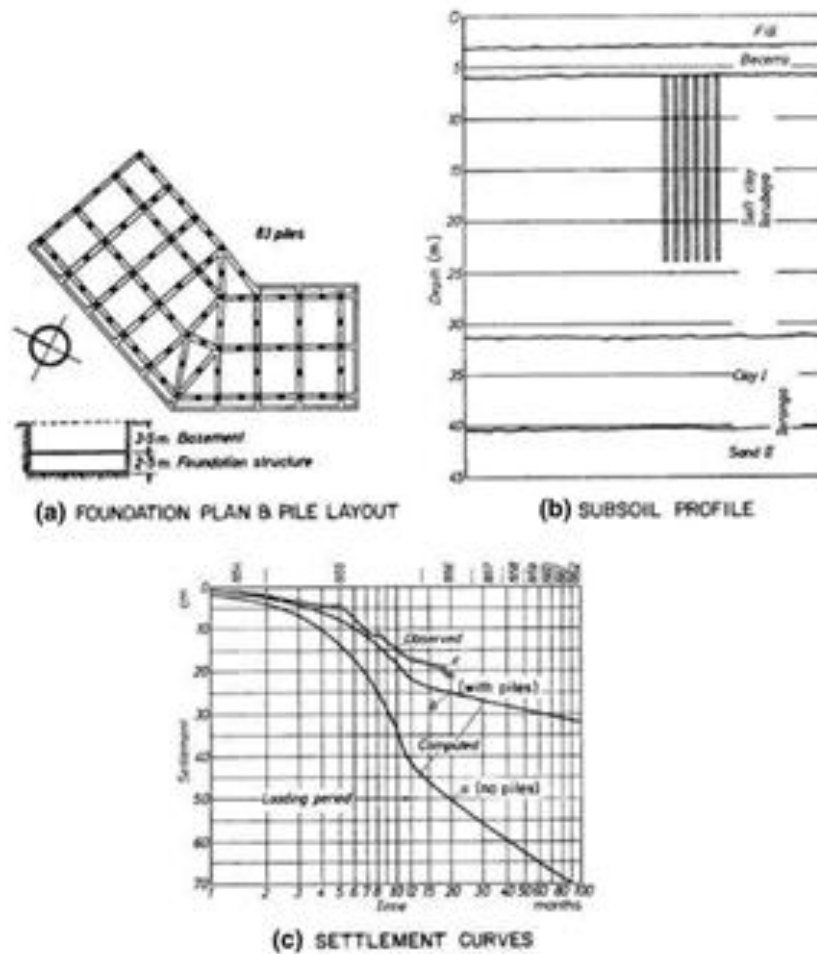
Details of La Azteca foundation (Zeevaert 1957)
